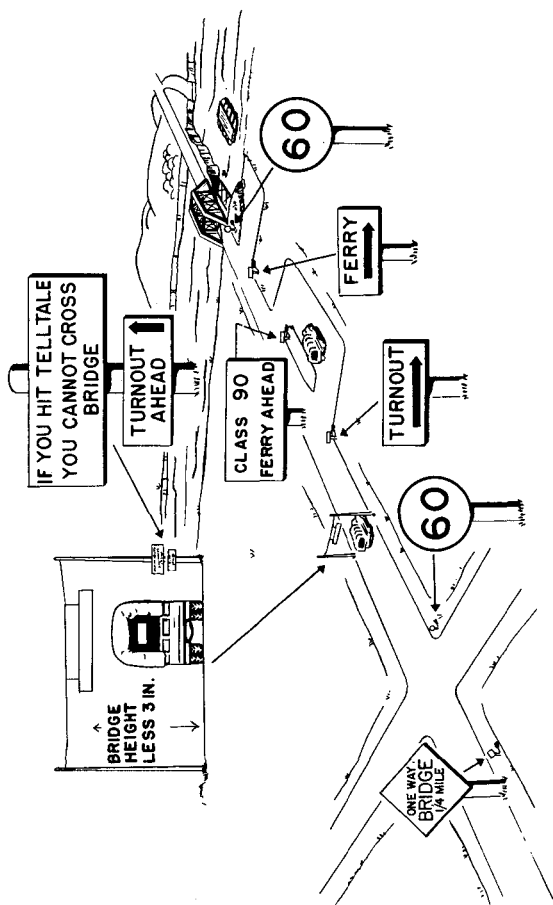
Typical single lane bridge applications of bridge class and information signs and road guide signs.
